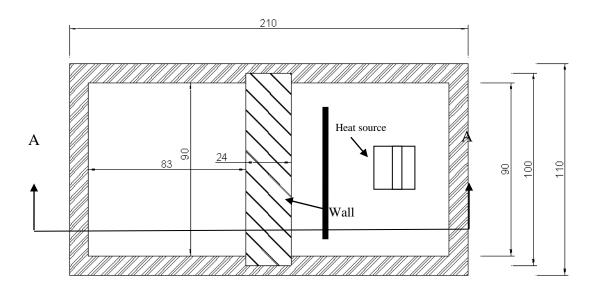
Plan of the test room showing the wall between the test rooms. Note: All measurements in the drawing in Figures 4-18 and 4-19 are in centimeters (cm).
